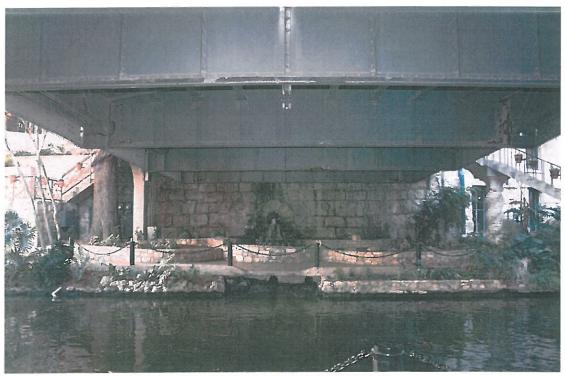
Underside of Crockett Bridge (Looking East at East Abutment Wall)
